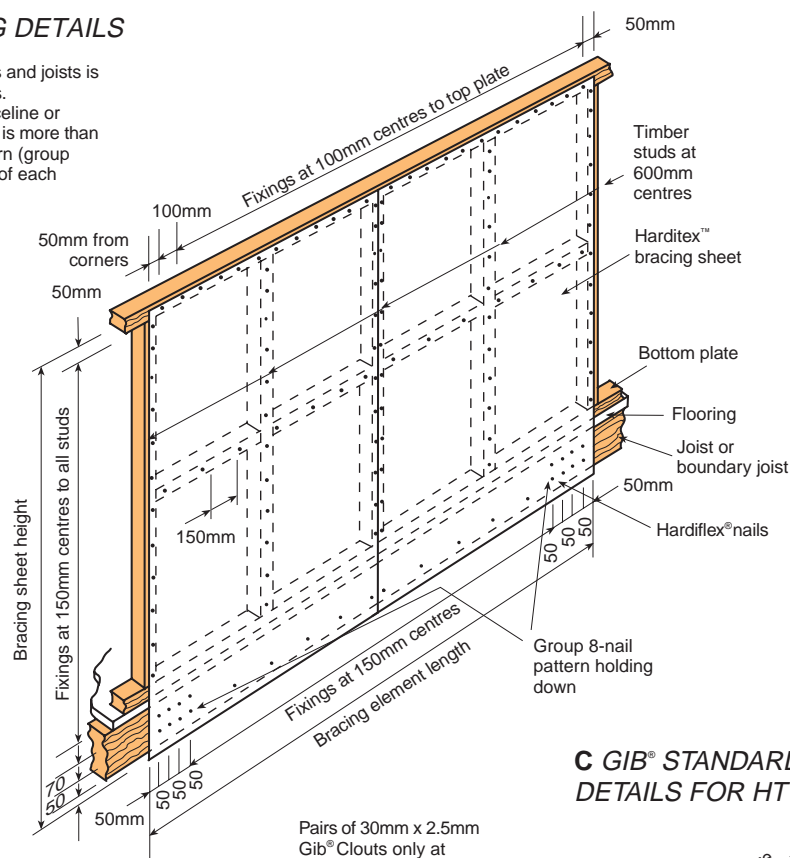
HARDITEX™/GIB® BRACELINE GROUP NAILING DETAIL TO TIMBER JOISTS (System HT13B)
